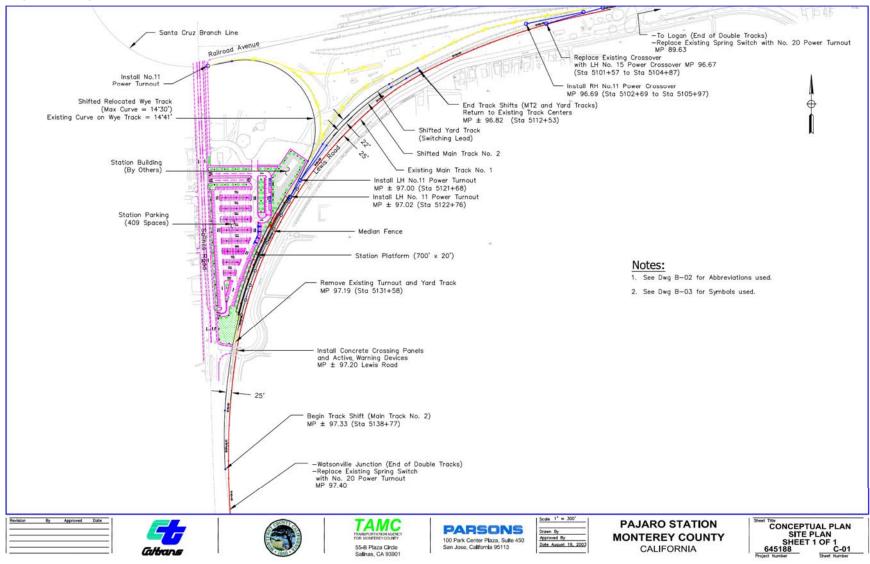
Pajaro Valley Station Site Parking Lot Plan
